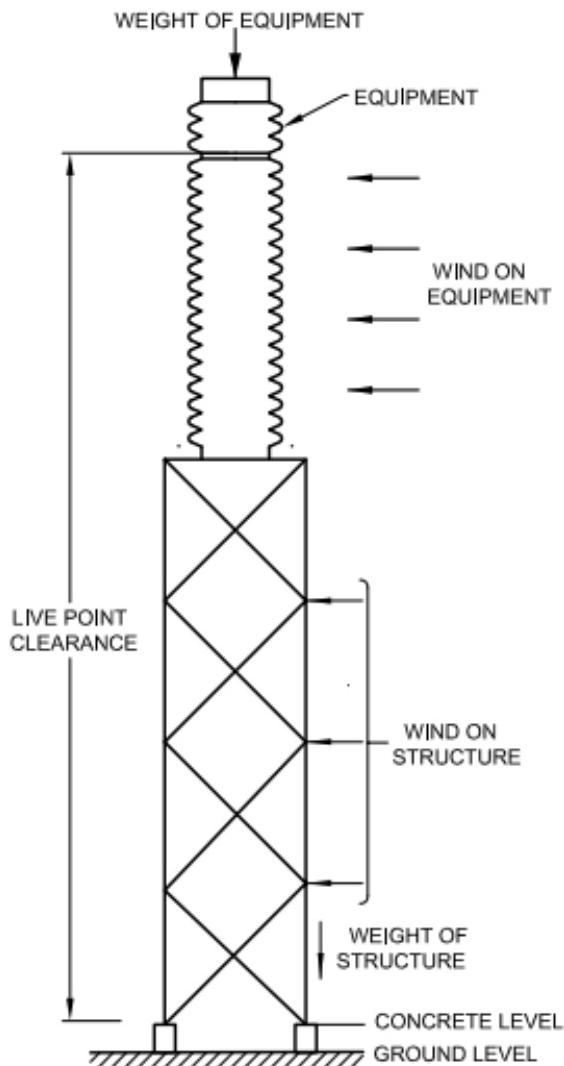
LOADING ON EQUIPMENT SUPPORT STRUCTURE
